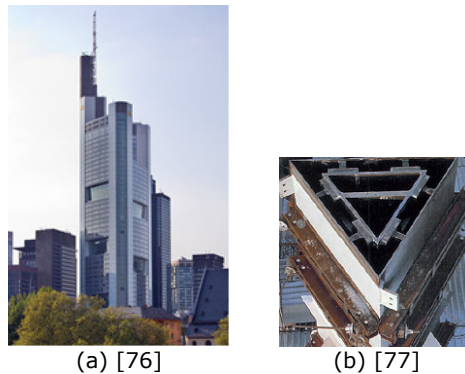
Commerzbank Tower in Frankfurt (a), cross section of column (b)
